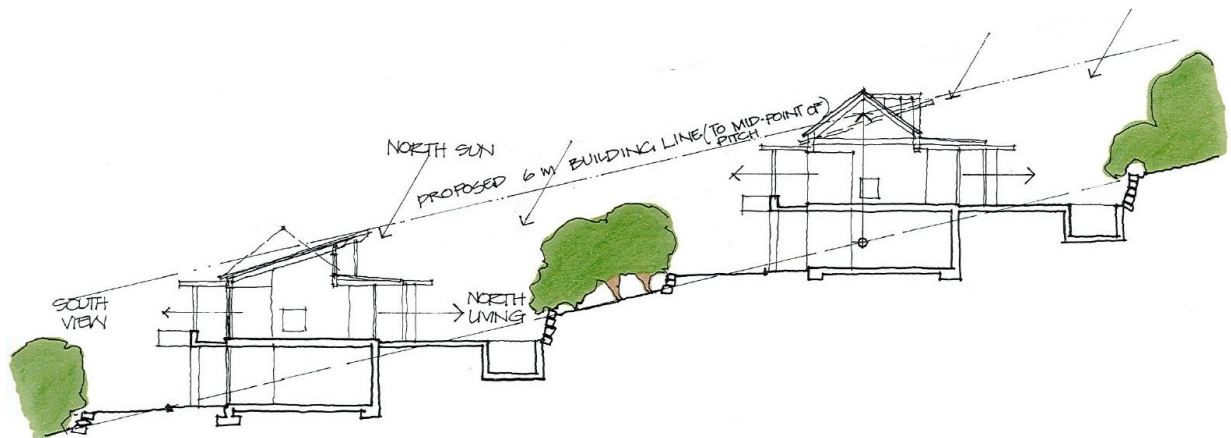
Typical cross section through single story & loft units indicating 6m height restriction
